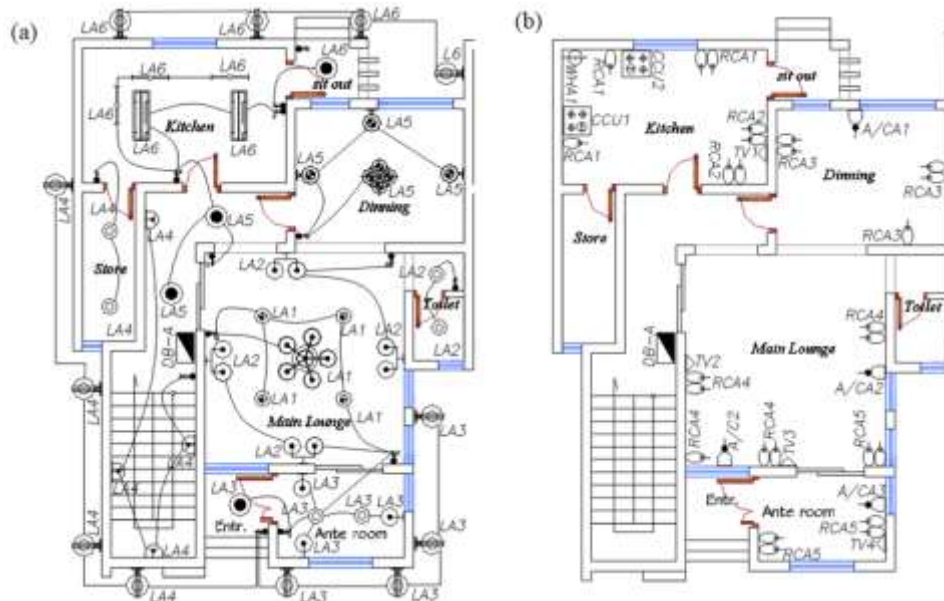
Electrical Layout on the Ground Floor (a) Lighting Point and (b) PowerPoint
